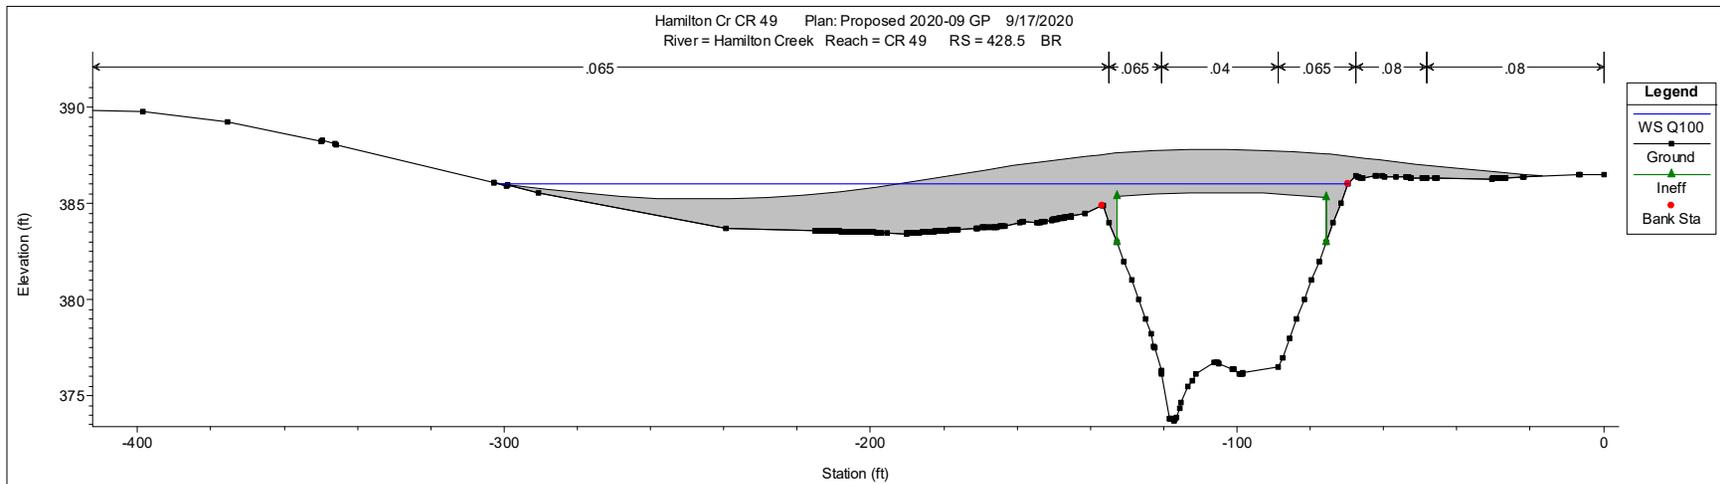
Upstream Face of Proposed Bridge, Looking Downstream (Northeast)
